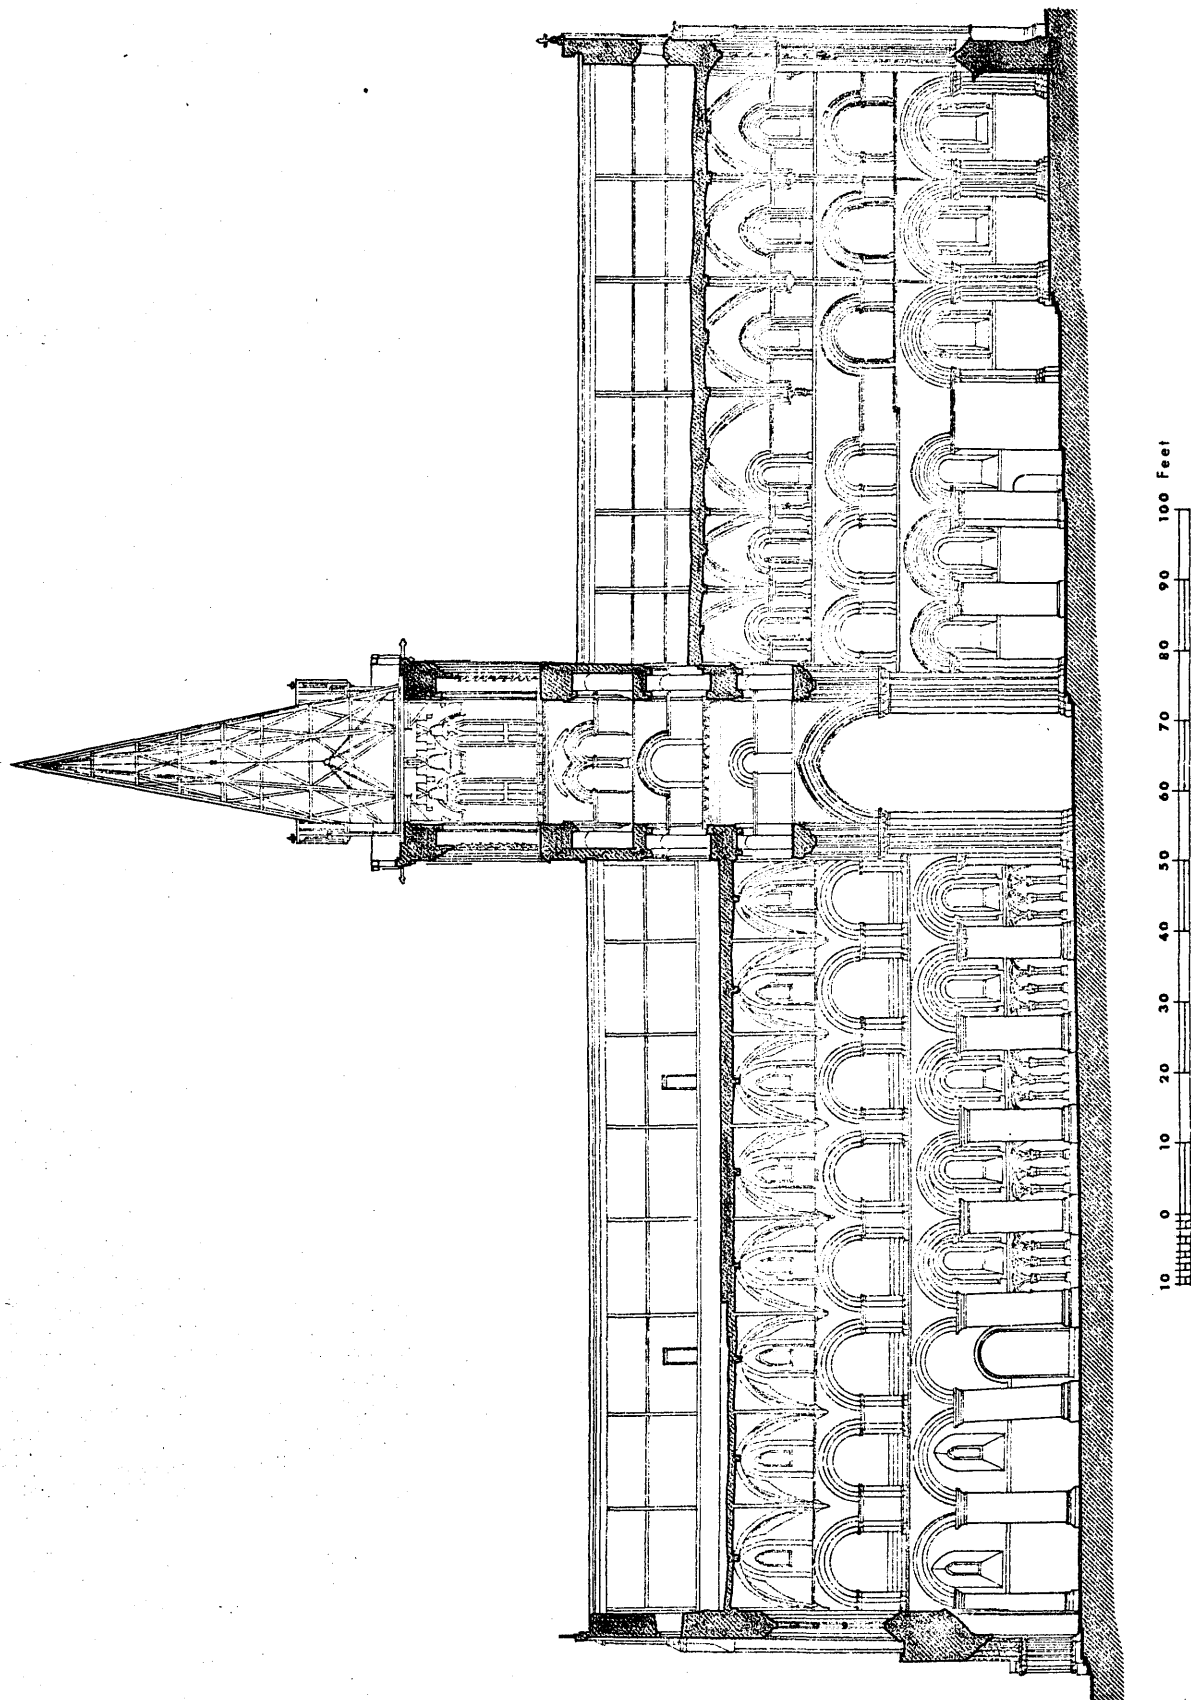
Kirkwall : St. Magnus Cathedral : elevation.
